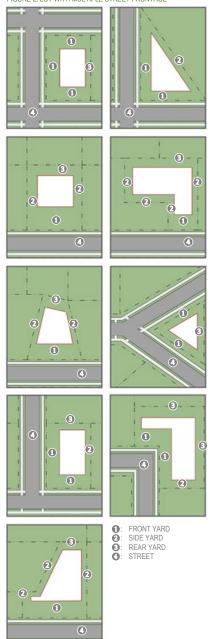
LOT WITH MULTIPLE STREET FRONTAGE
